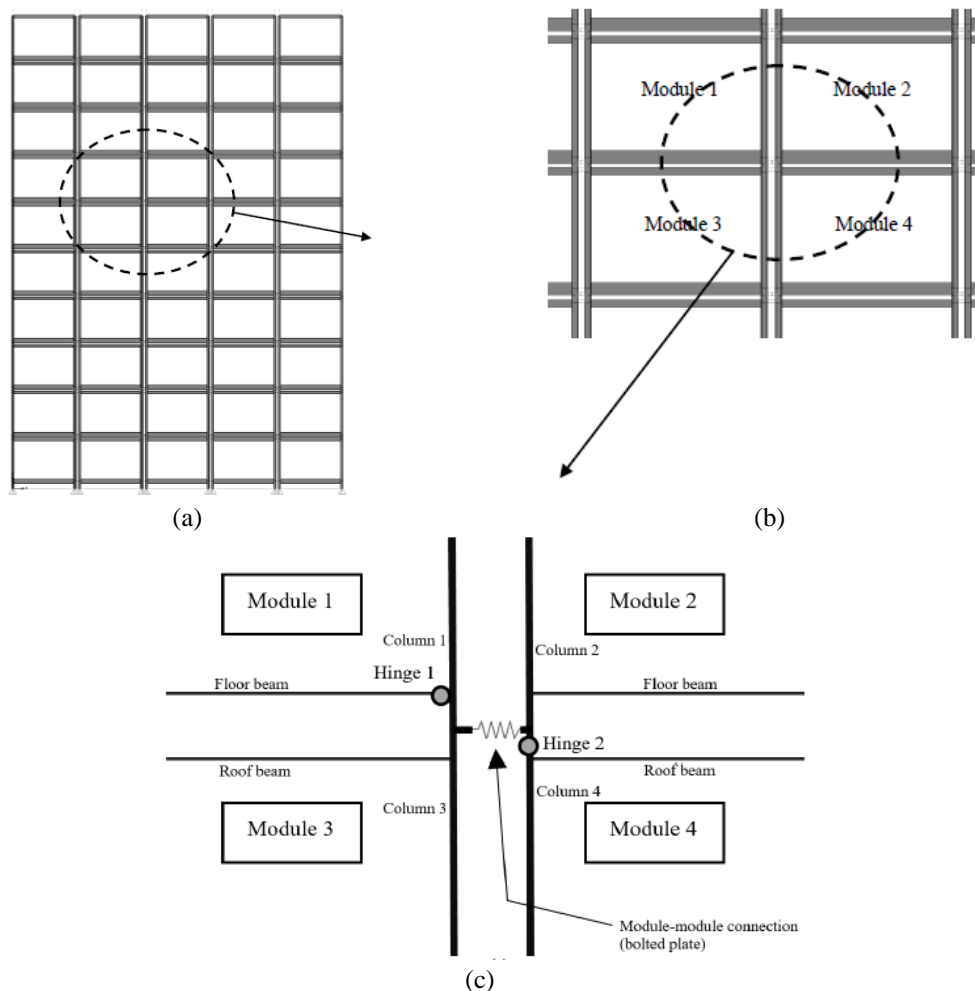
An illustration of the module-module connection and possible hinge locations (c) zoomed in from the front elevation of a modular building (a) and a close-up of the elevation view of neighbouring modules (b) connected by this module-module connection
